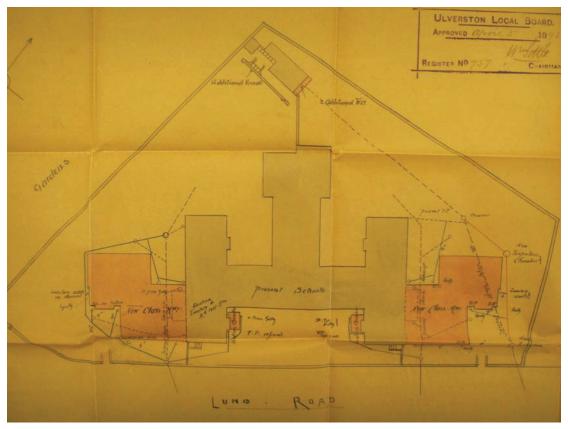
Block plan of proposed additions dated 1891 (CRO(WSUD/U/757 1892)
